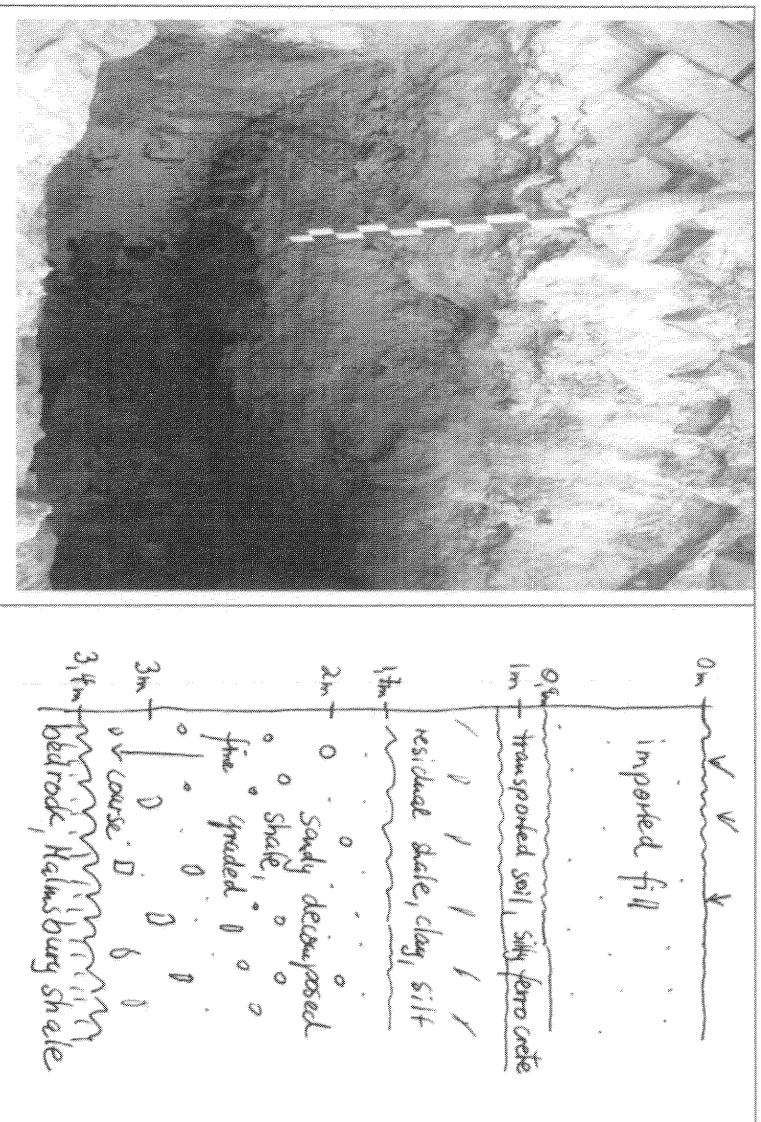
Test excavation SE corner of yard - Fig. 2b. Schematic diagram of layers
